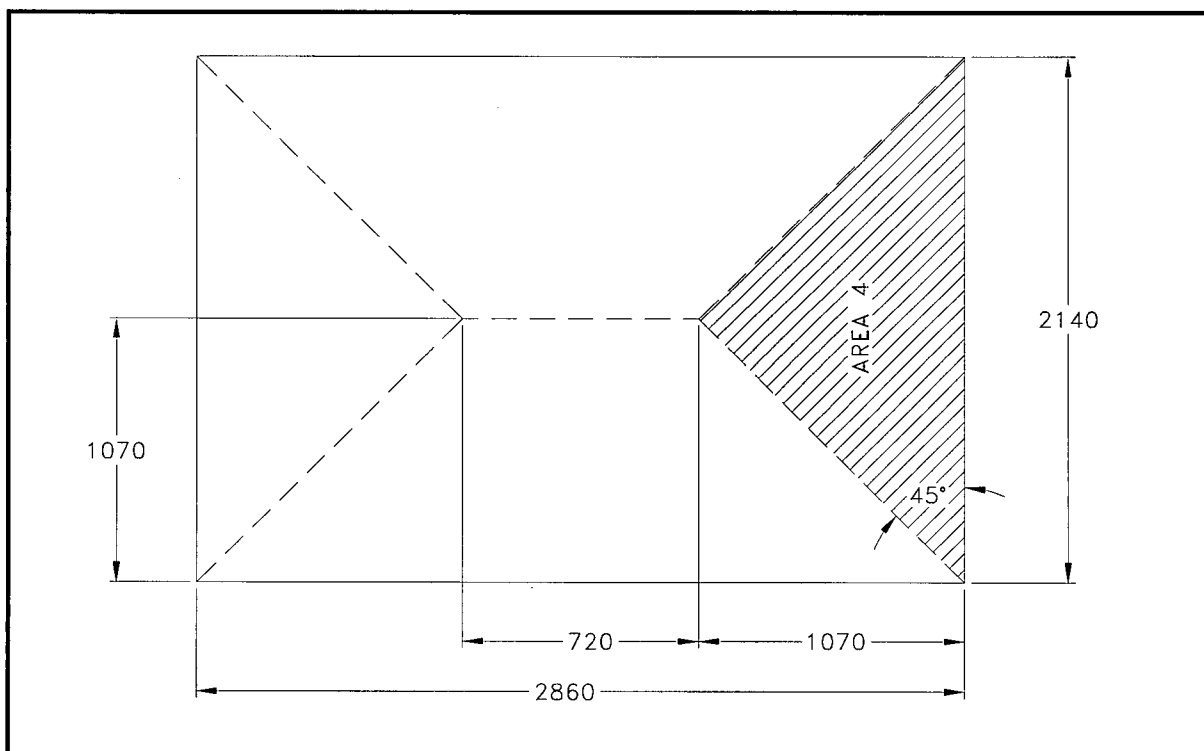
(e) – View of Area 4 on Side Wall Used to Calculate Edge Load on Rear Wall
